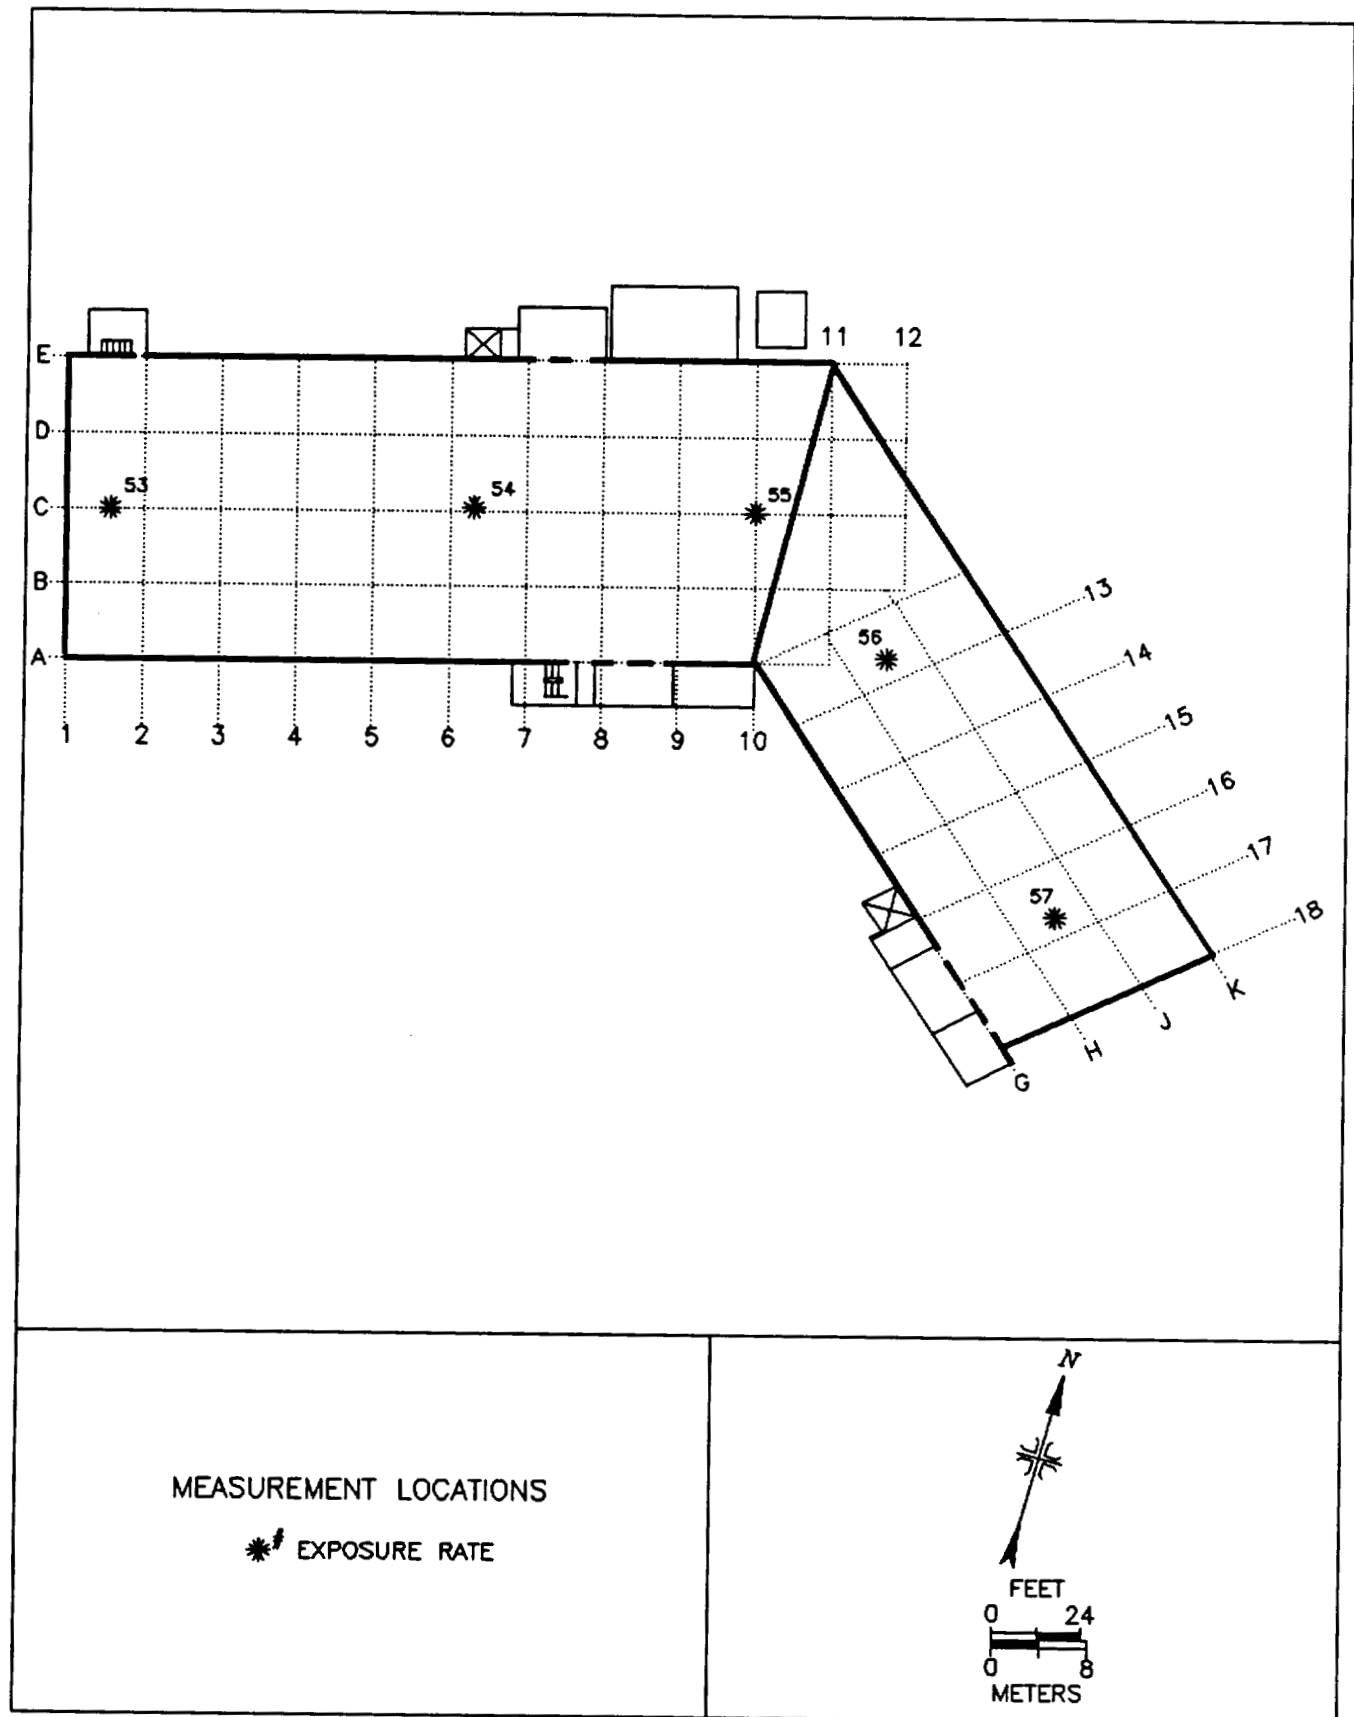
Building 8, Fifth Floor – Exposure Rate Measurement Locations
